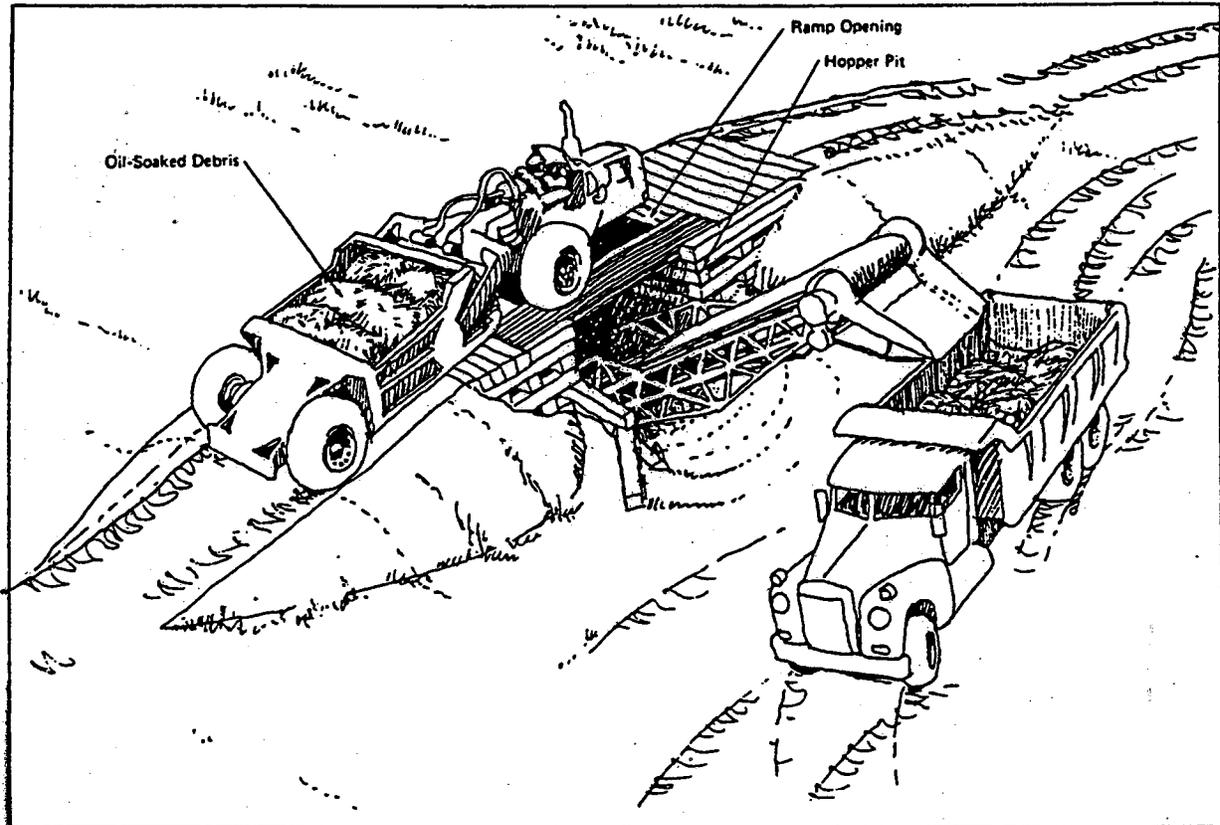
Unloading Ramp and Conveyor-Screening Plant
